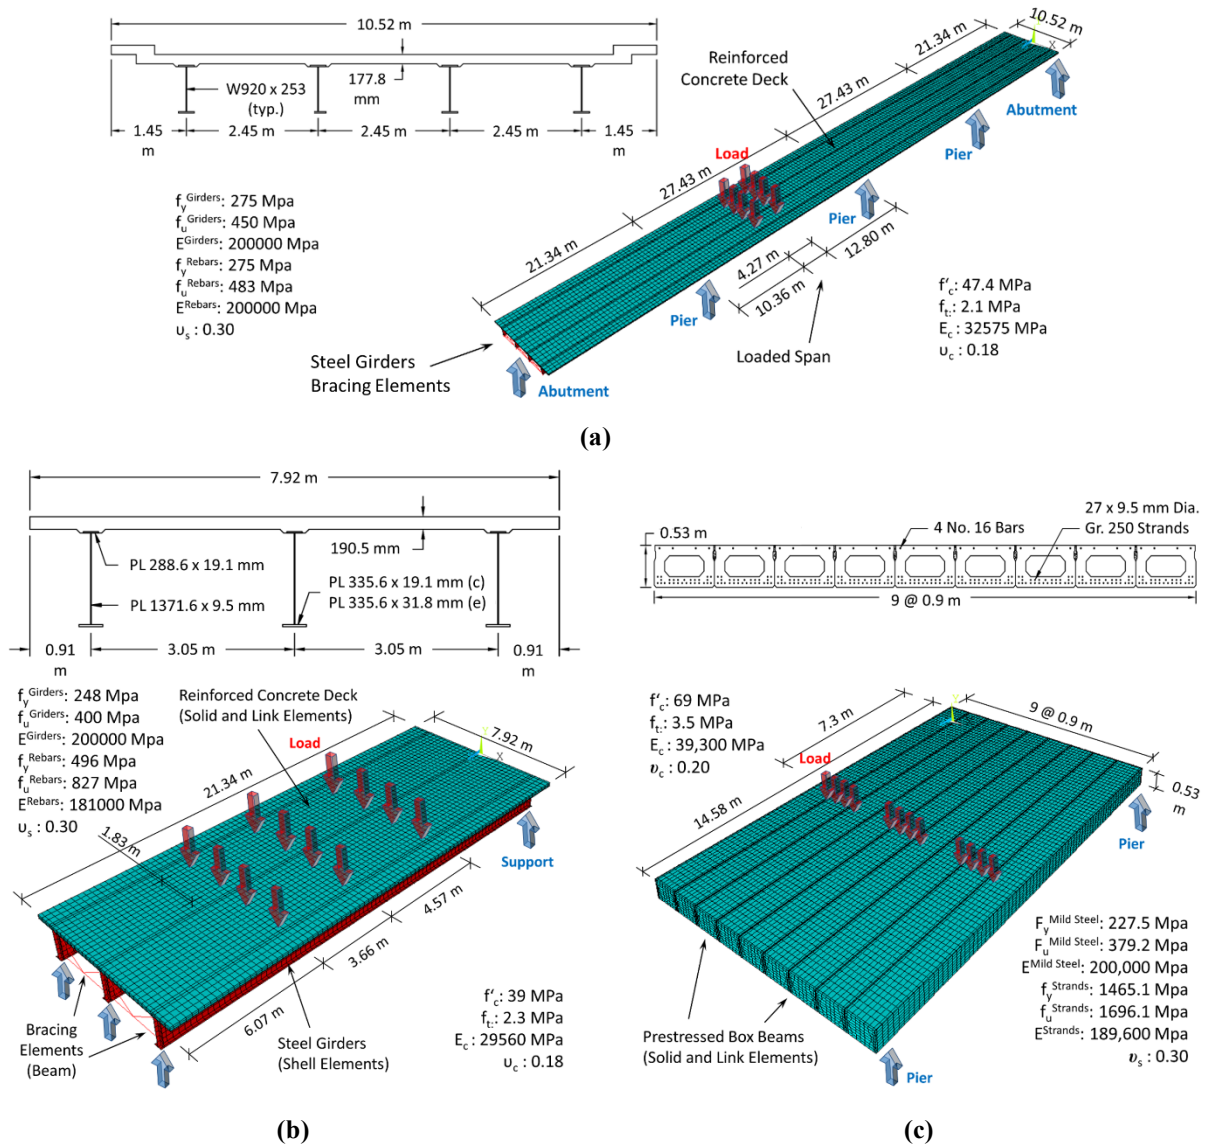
Intact system-level FE model development (a) continuous steel girder bridge (b) single span steel bridge model (c) prestressed concrete box bridge
